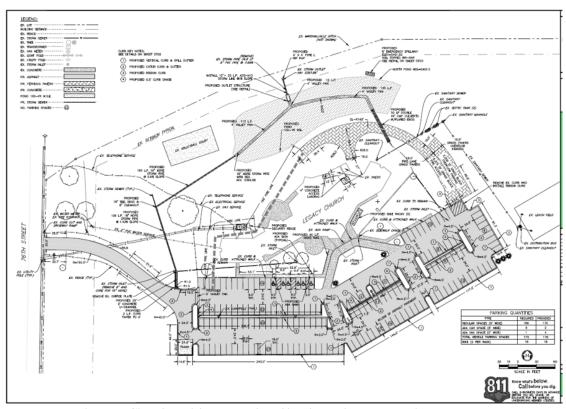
Site plan with proposed parking lot and stormwater improvements.
